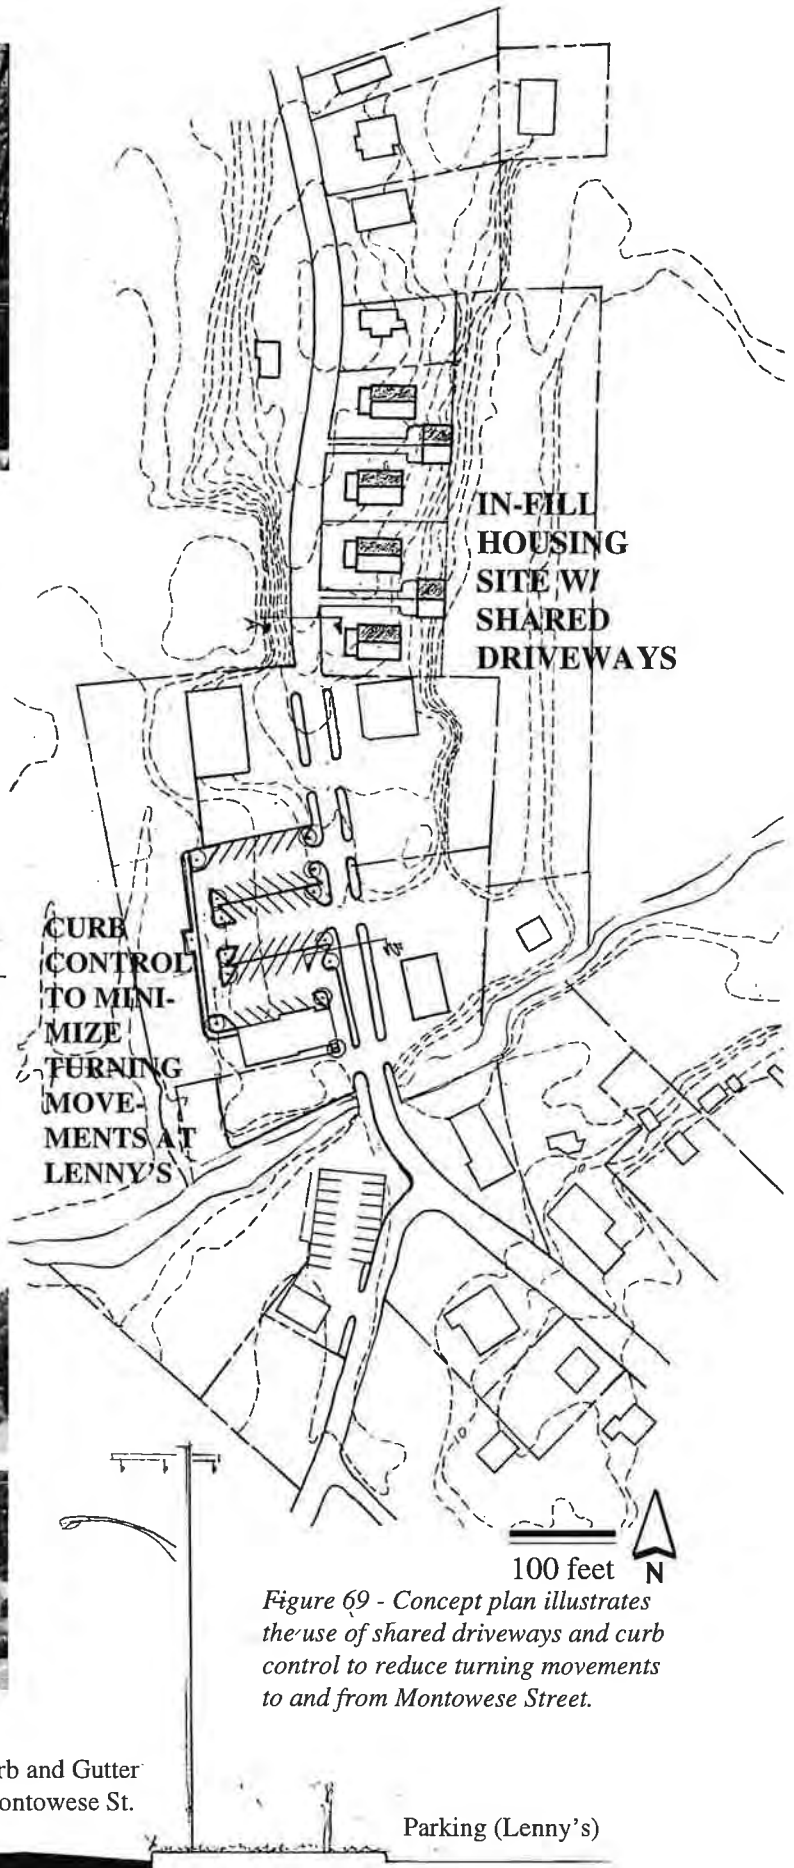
Concept plan illustrates the use of shared driveways and curb control to reduce turning movements to and from Montowese Street.
